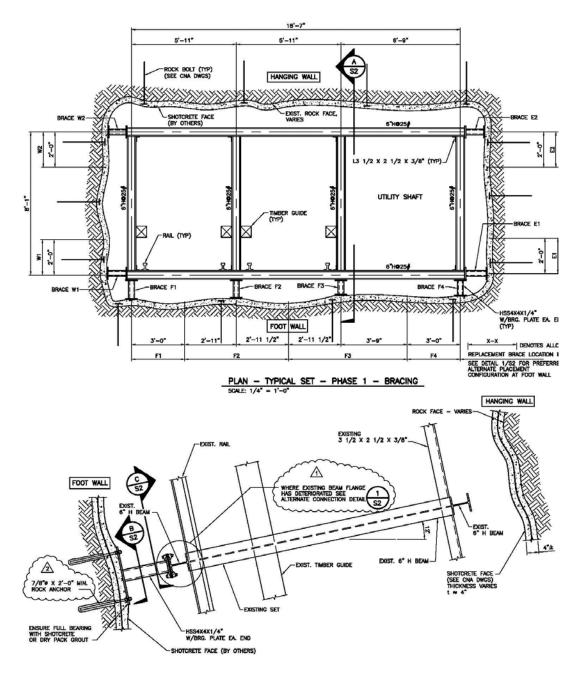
Plan and profile section of the shaft repair (Note: 1 in. = 25.4 mm; 1 ft = 0.328 m)
